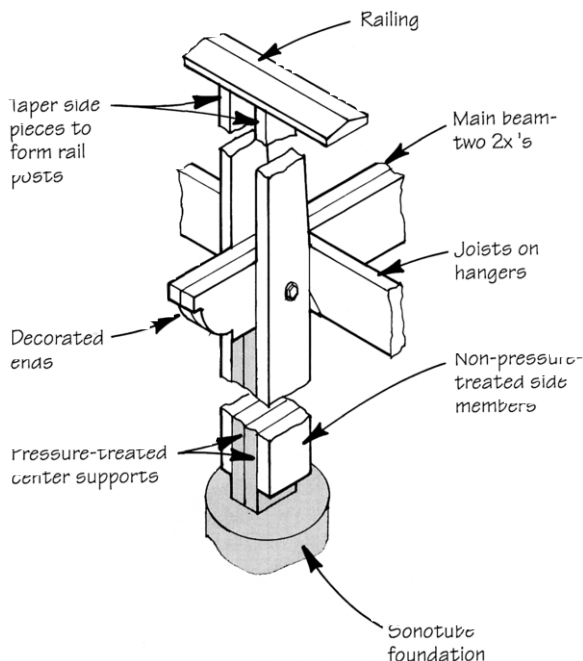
If you're building with wet lumber, 2x4 stock will shrink and twist less than larger pieces. In this design, the main beam sits on pressure-treated posts that run to the foundation. Untreated 2x4 posts start above ground level and extend to form rail posts.
